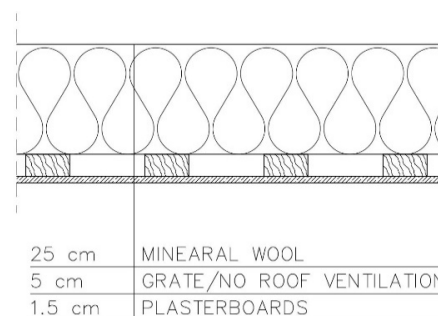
Variant 5: no PE foil in the arrangement of layers, no roof ventilation.
